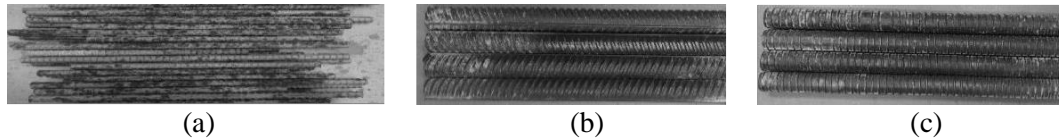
Images of some specimens from different sources where figures (a) shows the type A1 and B1 naturally corroded 16mm rebars, (b) shows type A2 uncorroded 16mm rebars, (c) shows type B2 uncorroded 16mm rebars.
